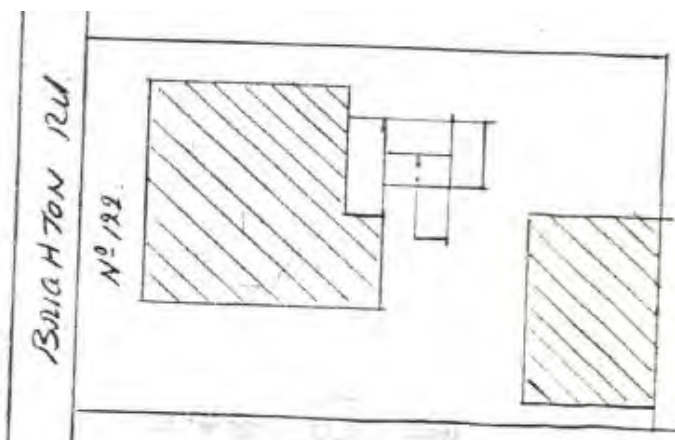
Site plan of the subject property in 1983. The block of flats is to the left, with new escape stairs behind it. The garages are shown to the right. (Source: St Kilda Council Building Permit No. 9675, 7 Mar 1983)
